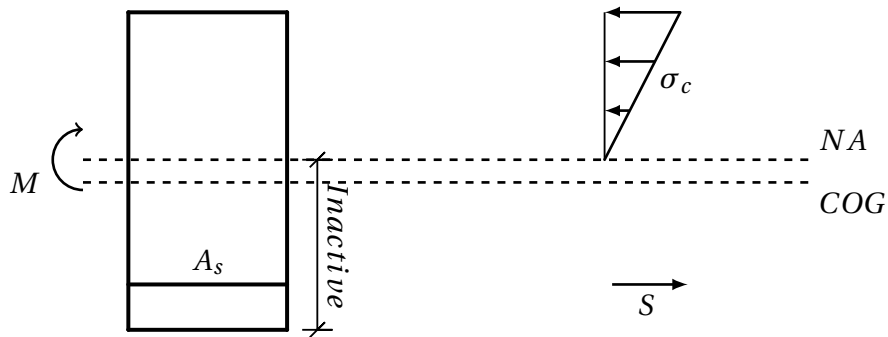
Internal forces for a cracked concrete section of a strip of the concrete panel loaded in bending.
